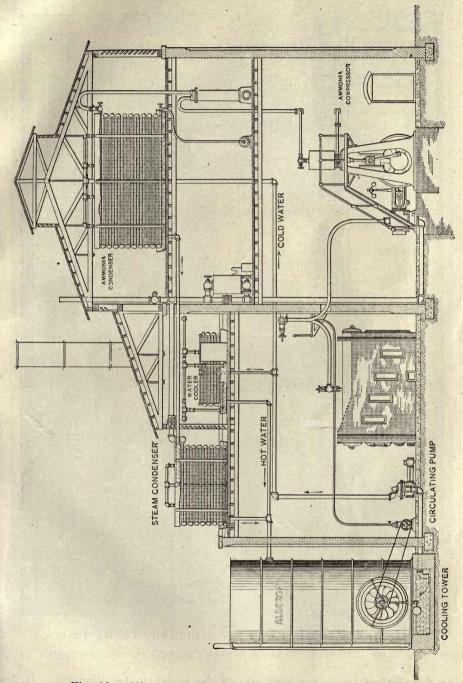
Alberger Cooling Tower Installed in Ice Plant.
